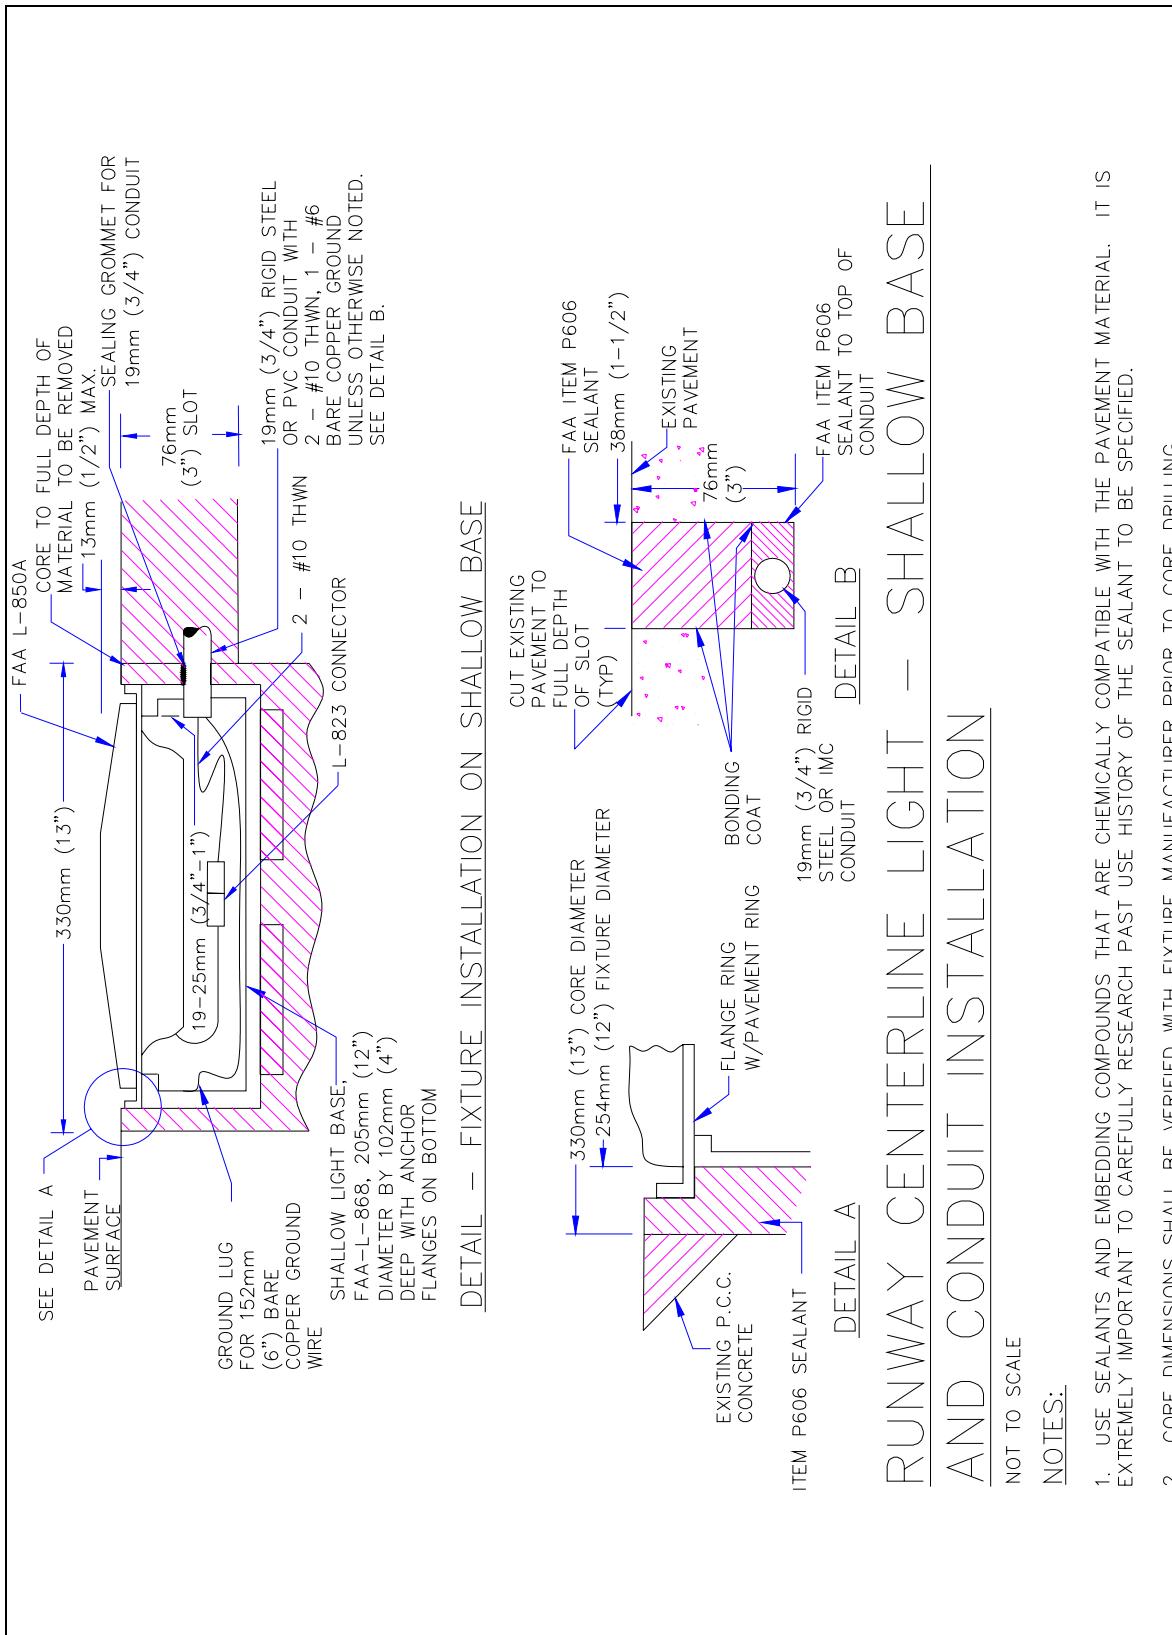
Runway Centerline Light – Shallow Base & Conduit Installation
